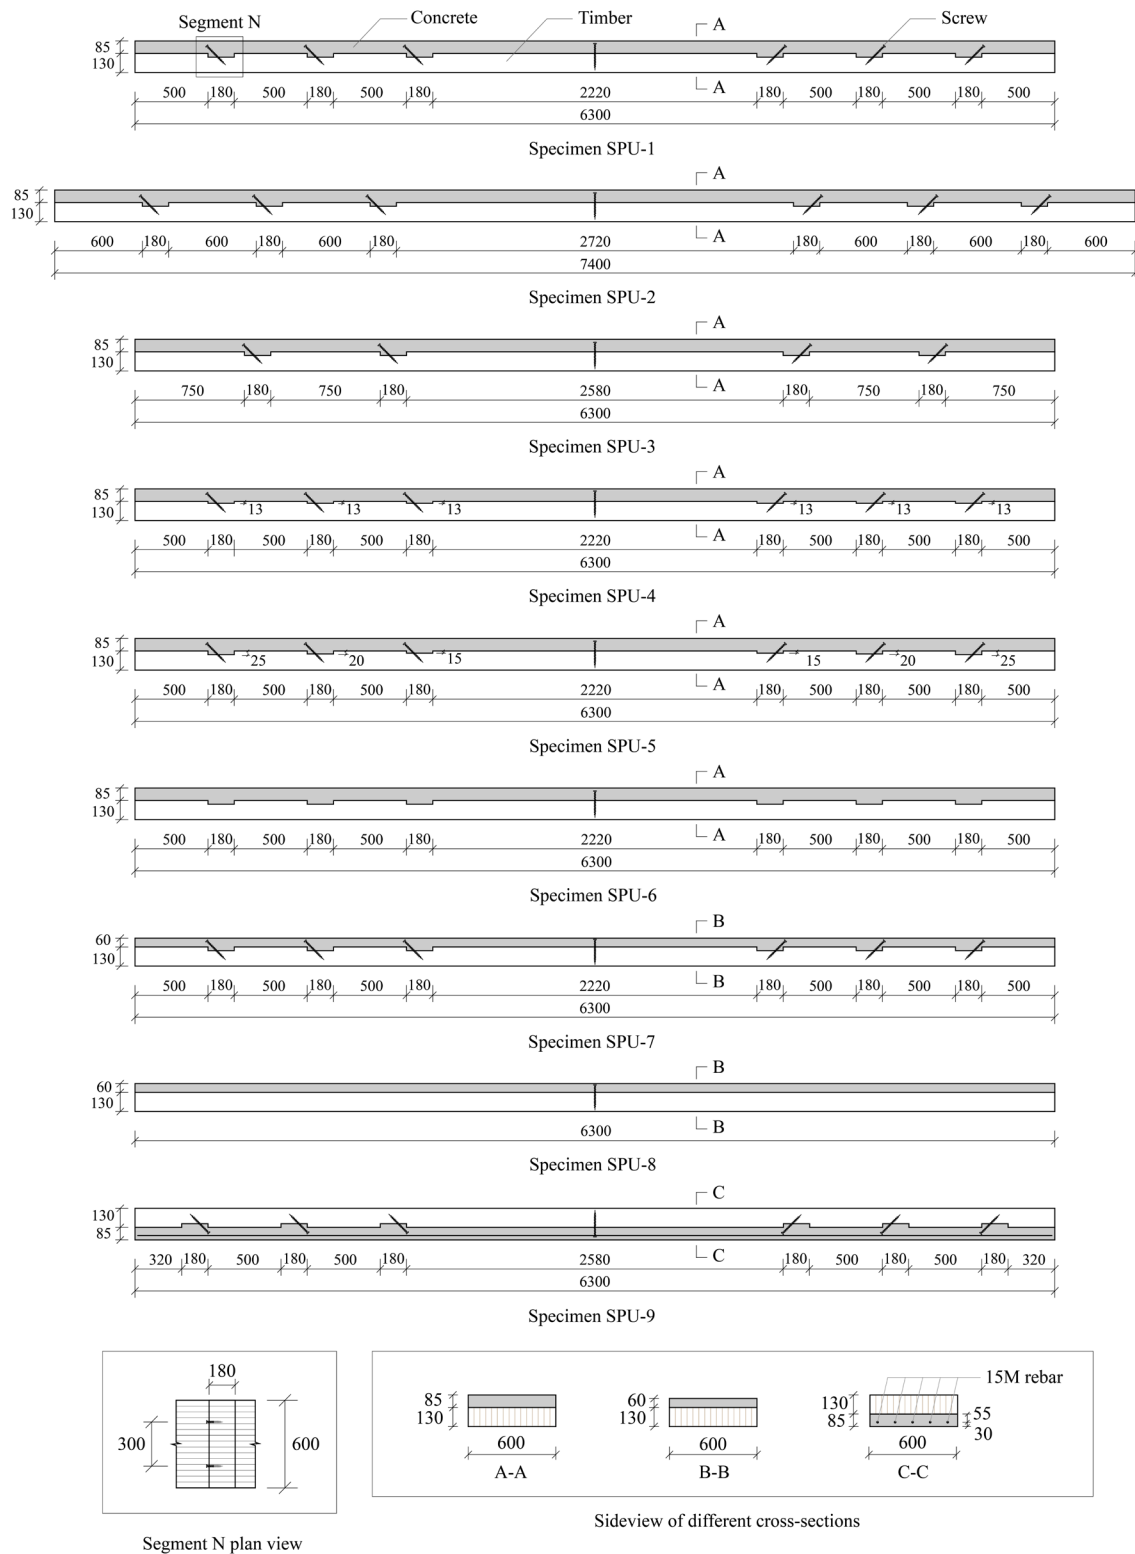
Mass timber panel-concrete composite floor specimen configurations (the unmarked depth of notches is 25 mm)
